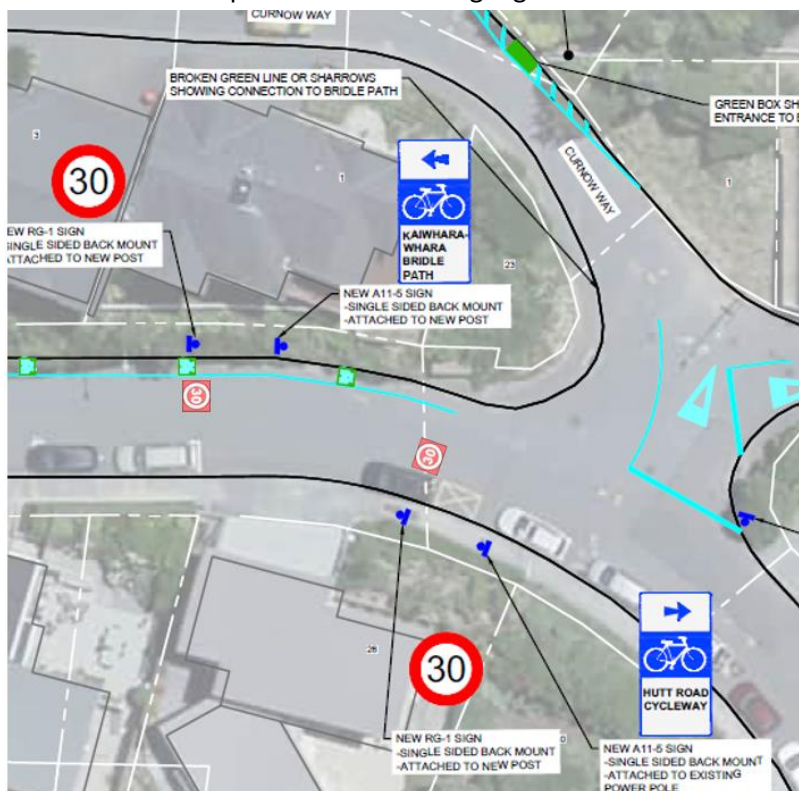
Plan showing road marking option for speed repeaters along Cameron Street
